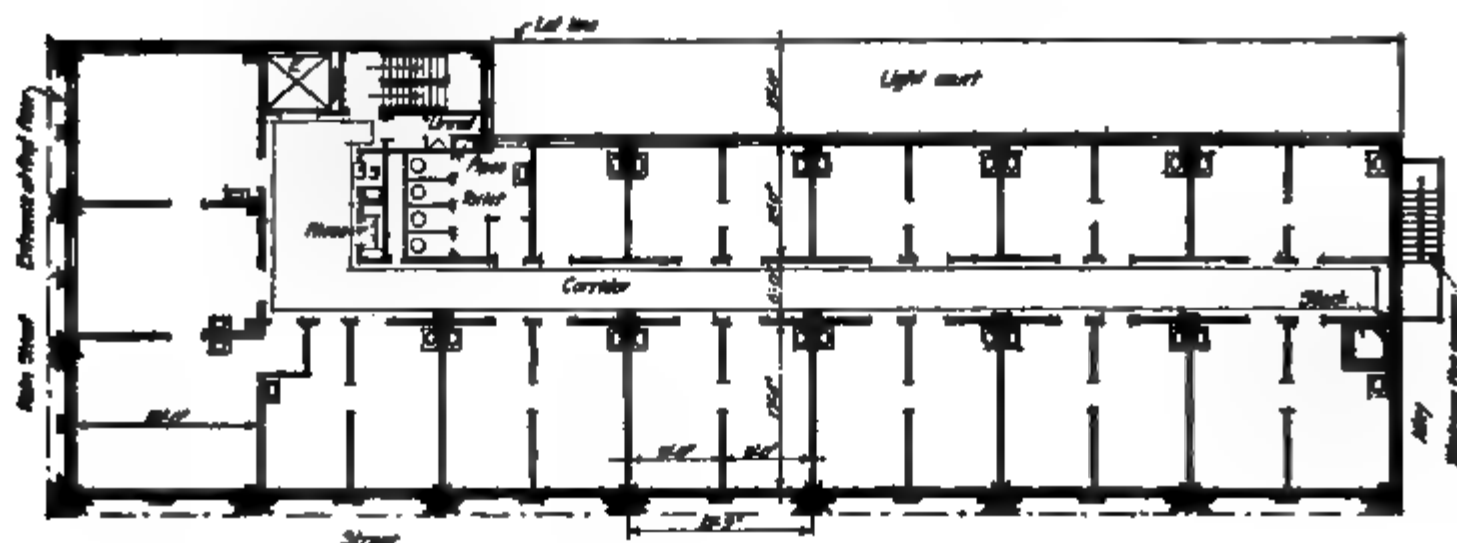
Typical plan of 4 or 5-story office building on corner lot. Entrance on main street.
